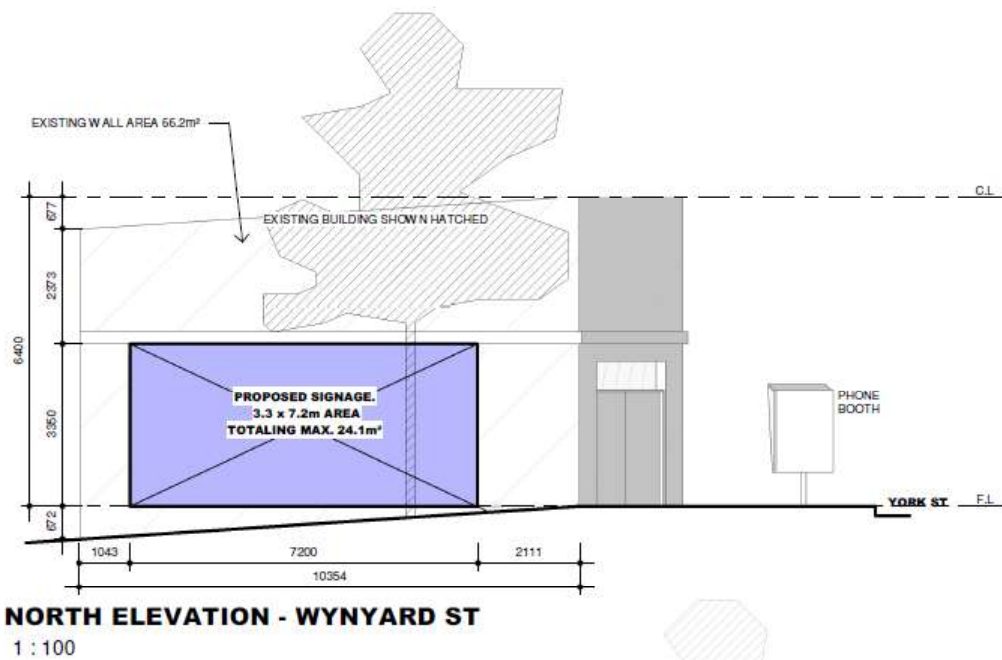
Northern Elevation (Source: Rob Pickett Design)
